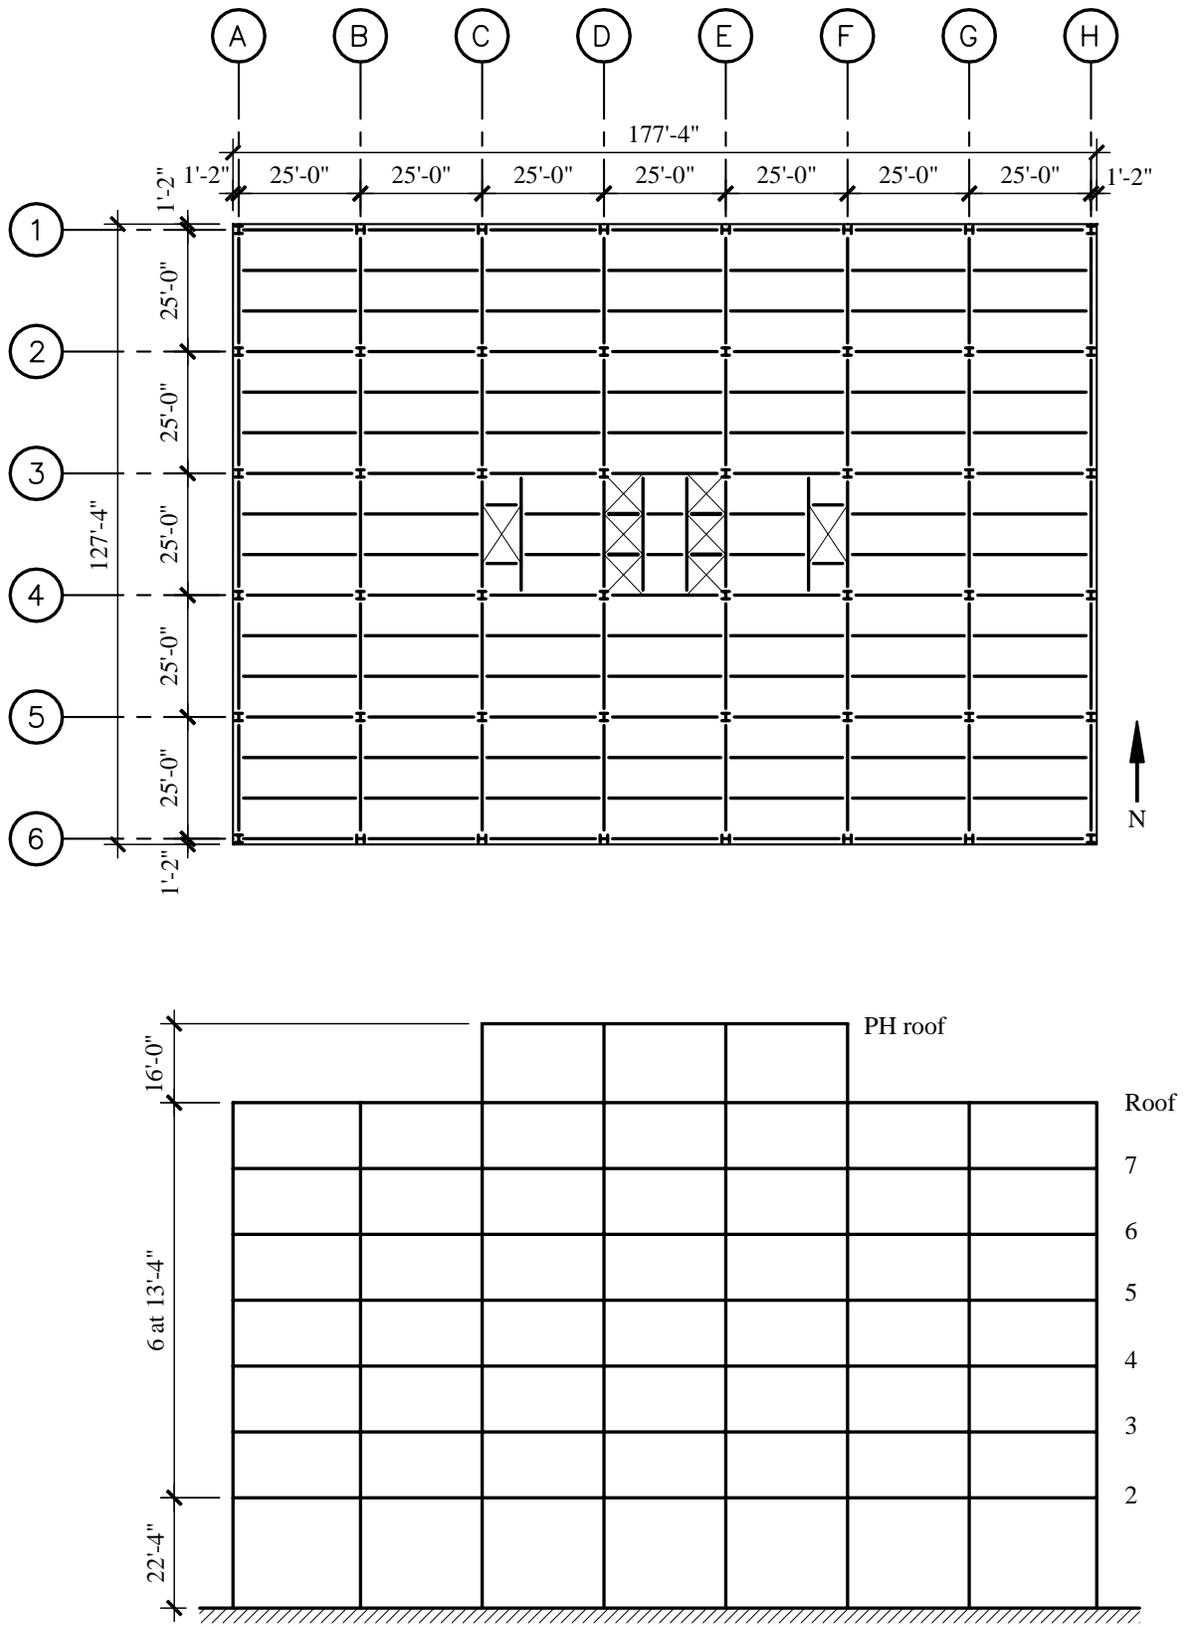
Typical floor framing plan and building section (1.0 in. = 25.4 mm, 1.0 ft = 0.3048 m).
